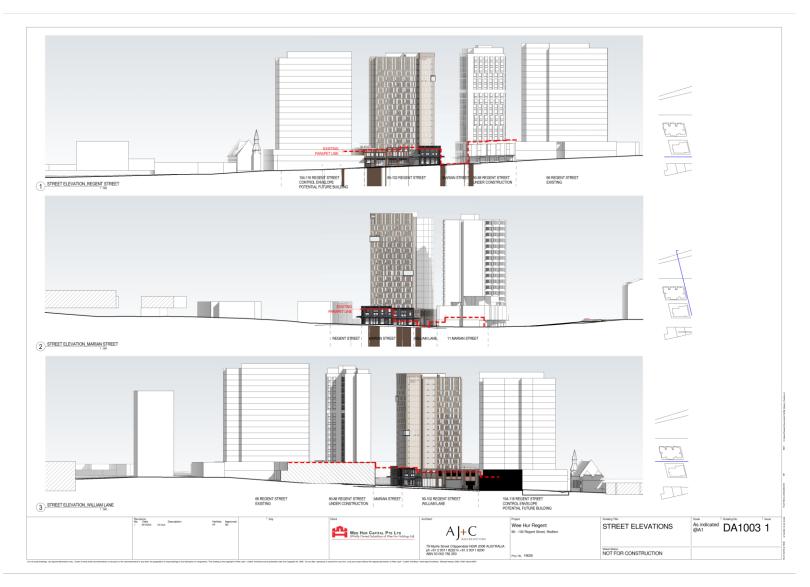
Proposed design elevation showing Aboriginal design in tower panels - western elevation
